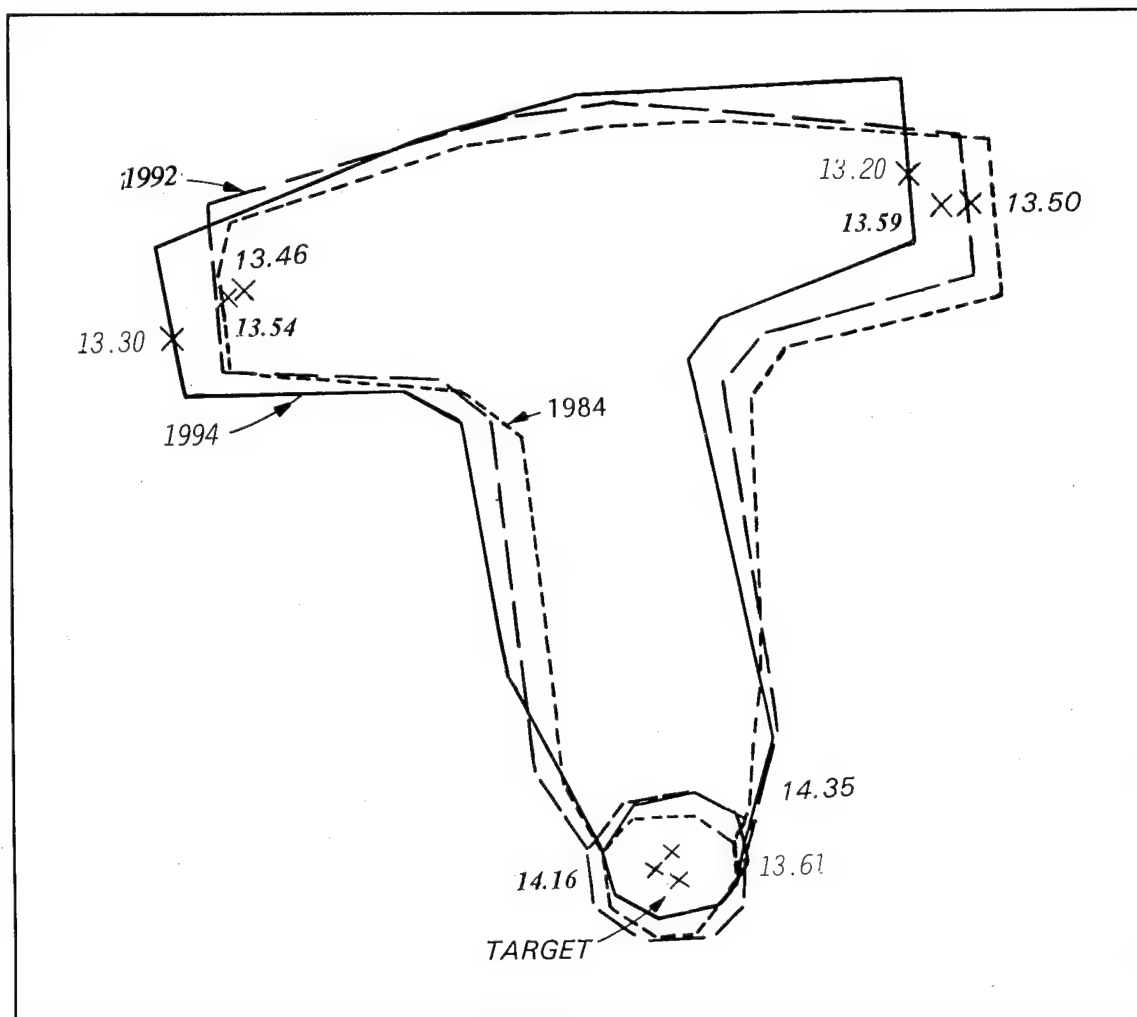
Example of targeted armor unit horizontal positions and additional elevations obtained for the various photogrammetric surveys
